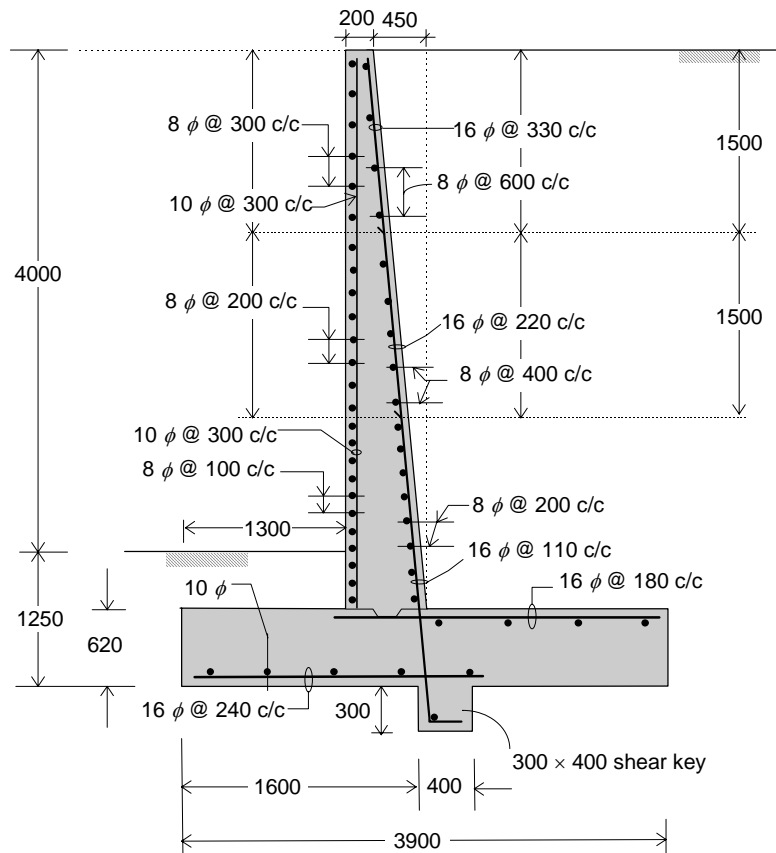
Detailing of cantilever wall — Example 14.9
